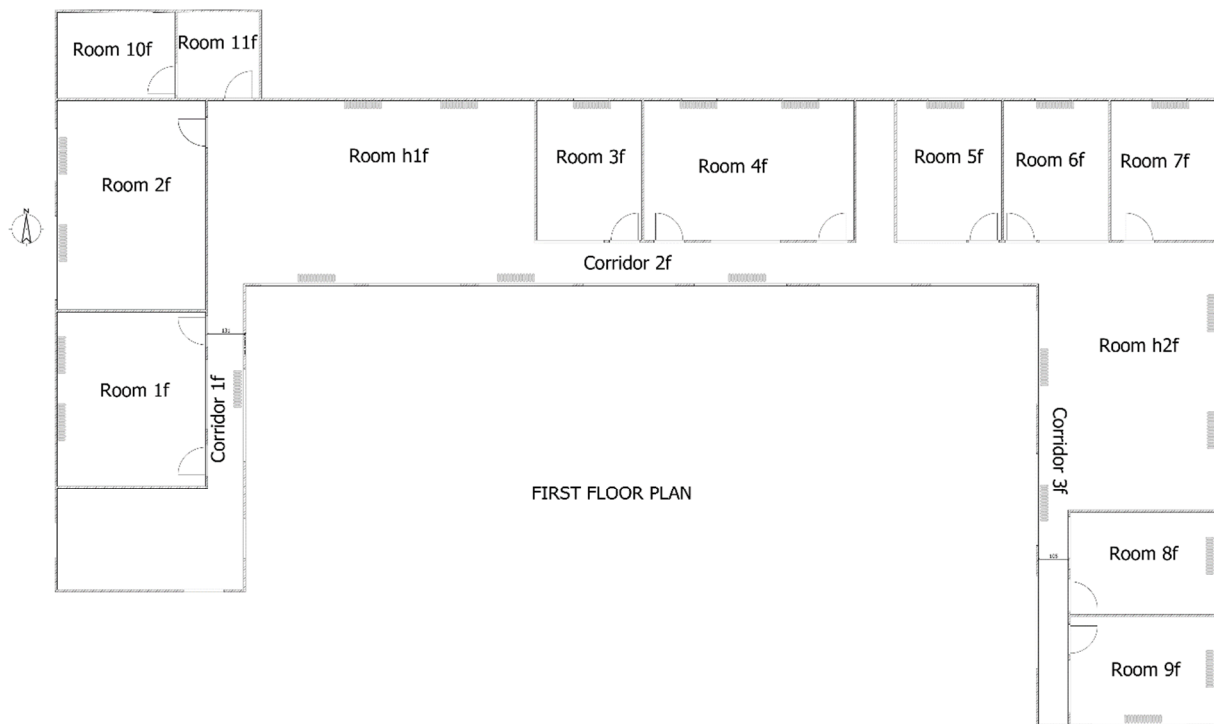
First floor plan of Nomadic Residential School, Puga
